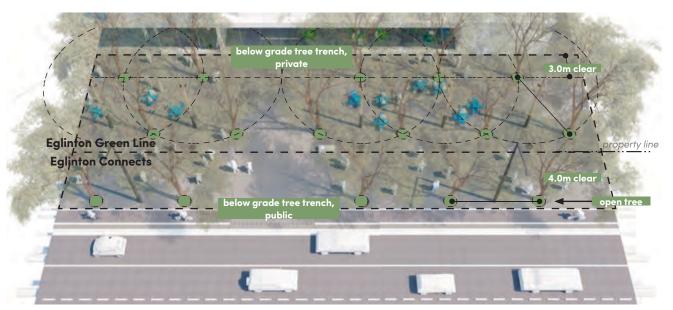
Planting arrangement diagram from Eglinton Green Line Landscape and Public Realm Standards
